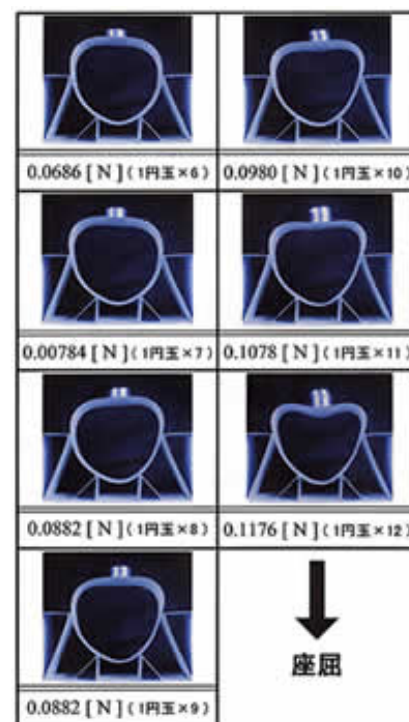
Model test of buckling failure by using 1 yen coins and a hollow paper support
